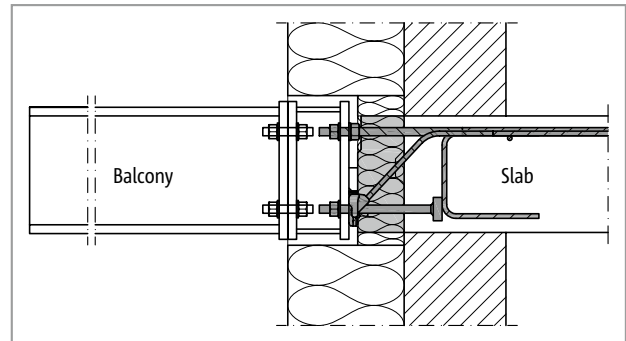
Schöck Isokorb® T type SK: Connection of the steel member to an adapter that equalises the thickness of the outer insulation
